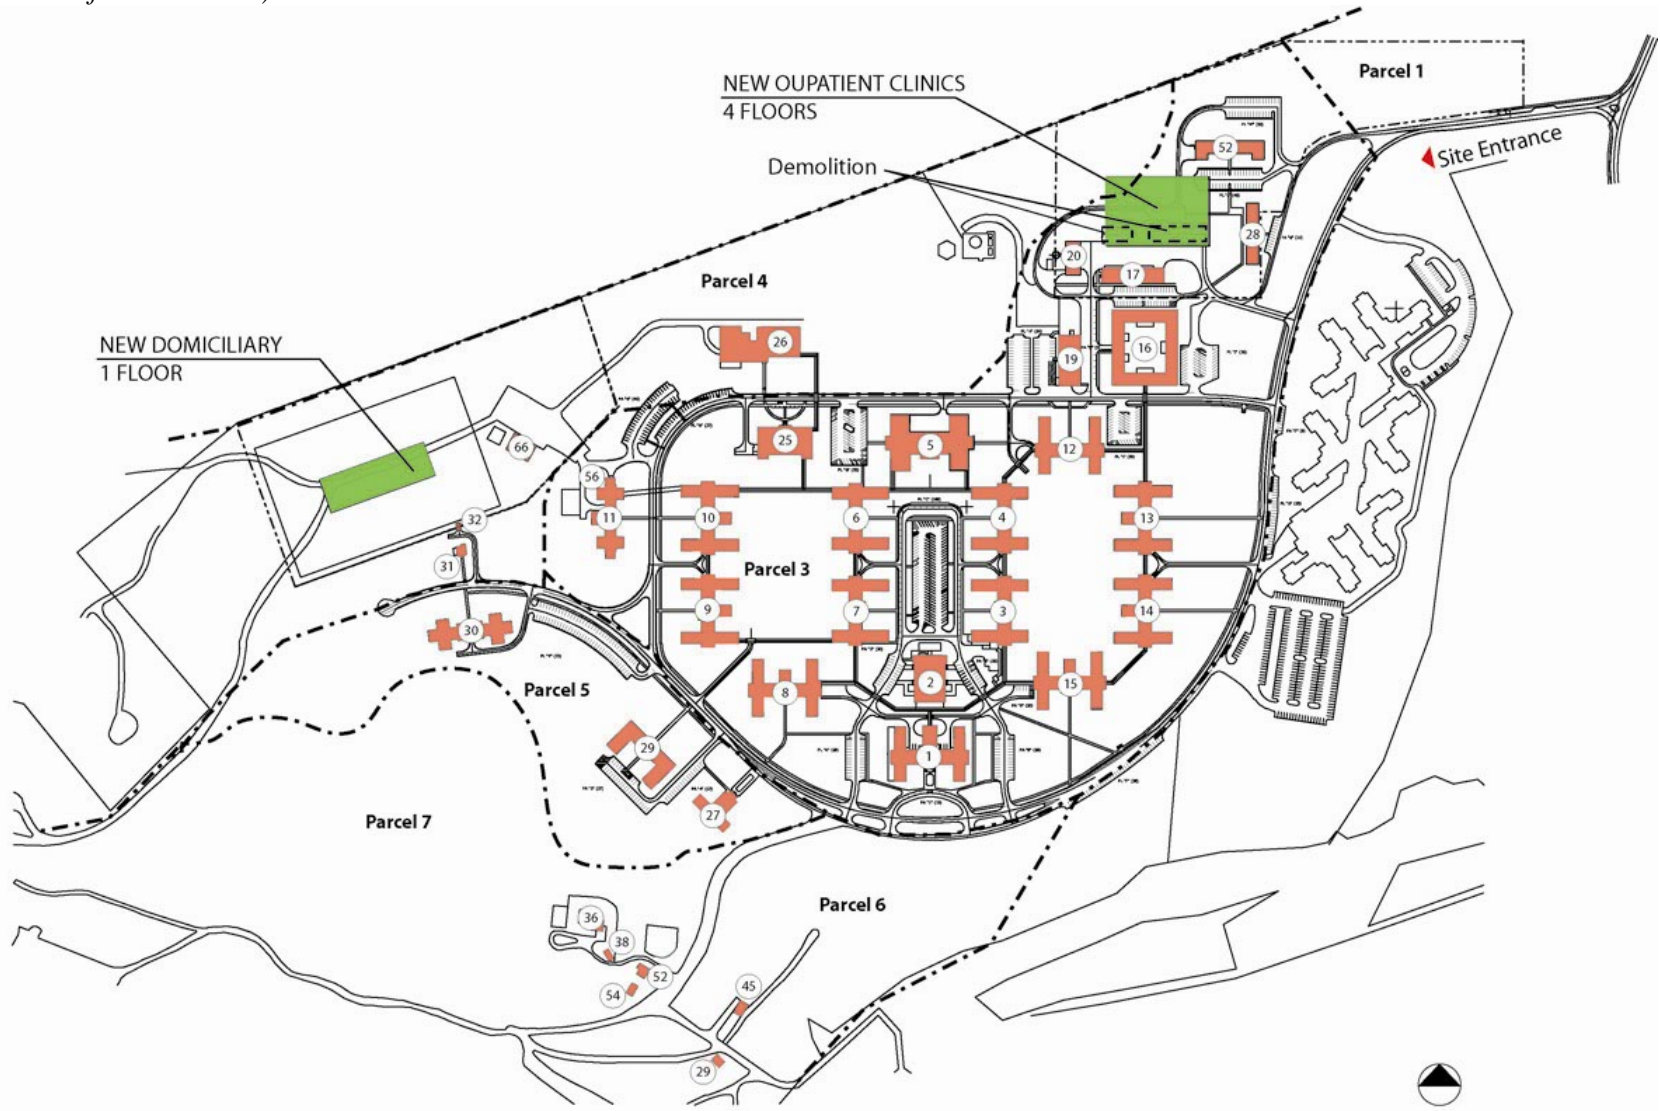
Proposed New Site Plan - BPO 6 (At Montrose, Construct New Domiciliary on Northwest Campus, New Ambulatory Care Facility at Campus Entrance)
